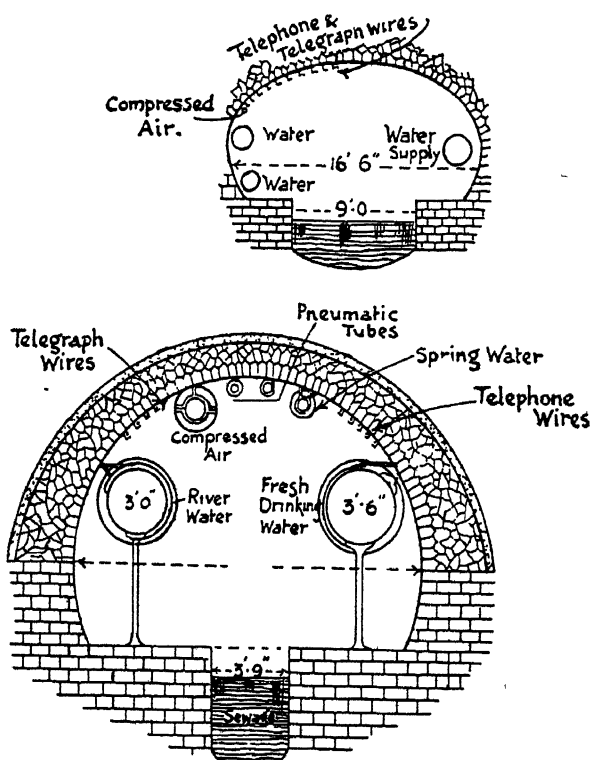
SECTION OF SUBWAYS, PARIS.
